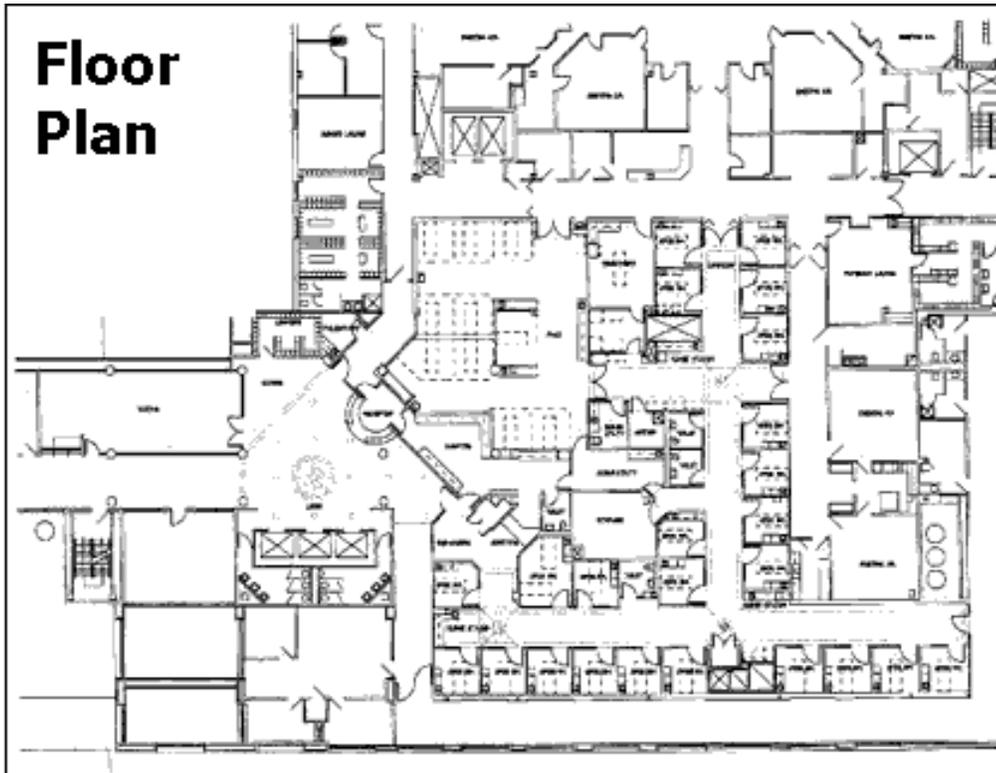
Suite floor plan. The patient rooms are served by a common corridor, which features three nurse stations at primary circulation nodes.
